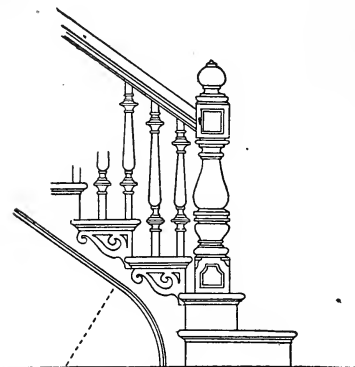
Side Elevation of Open-String Stair with Bullnose Steps.
